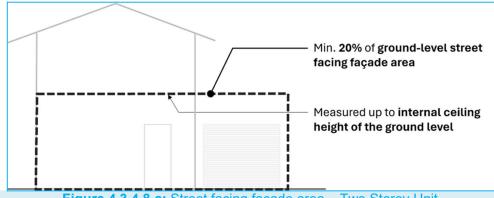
c: Street facing facade area – Two Storey Unit
